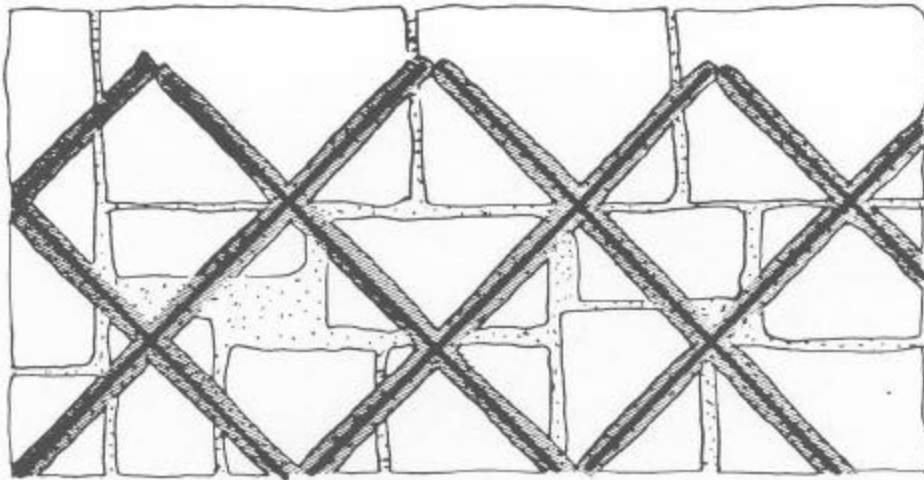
Overlapping inclined reinforcements (reticolo cementato)
